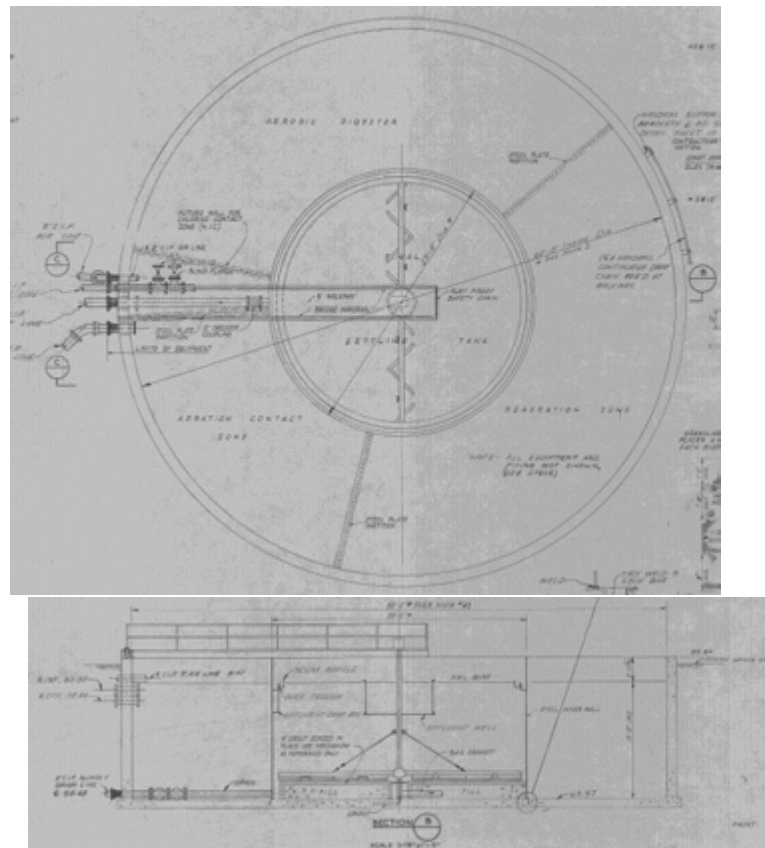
Plan and Typical Section of Walker Process Sparjair Contact Stabilization Unit
